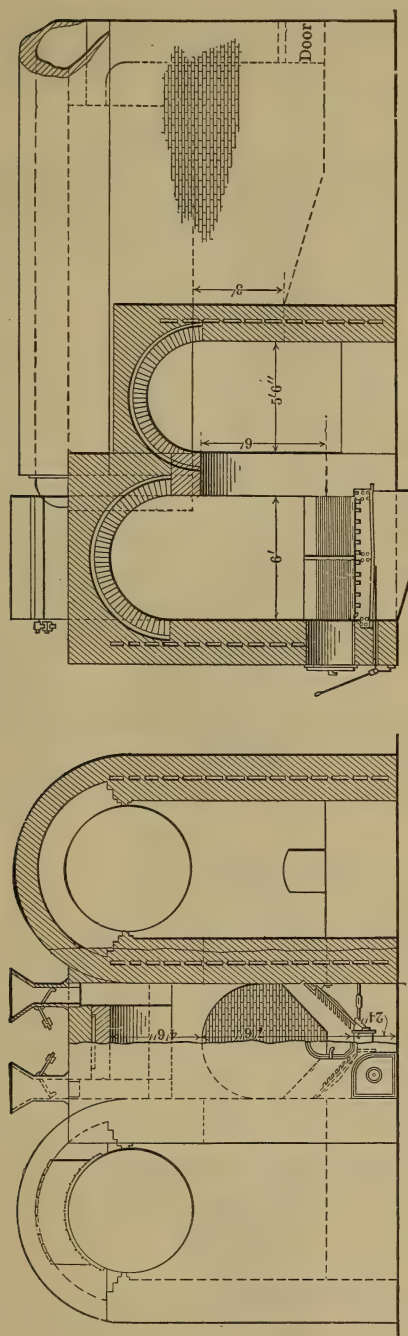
Sectional Elevations of the Myers Furnace for Burning Bagasse.
